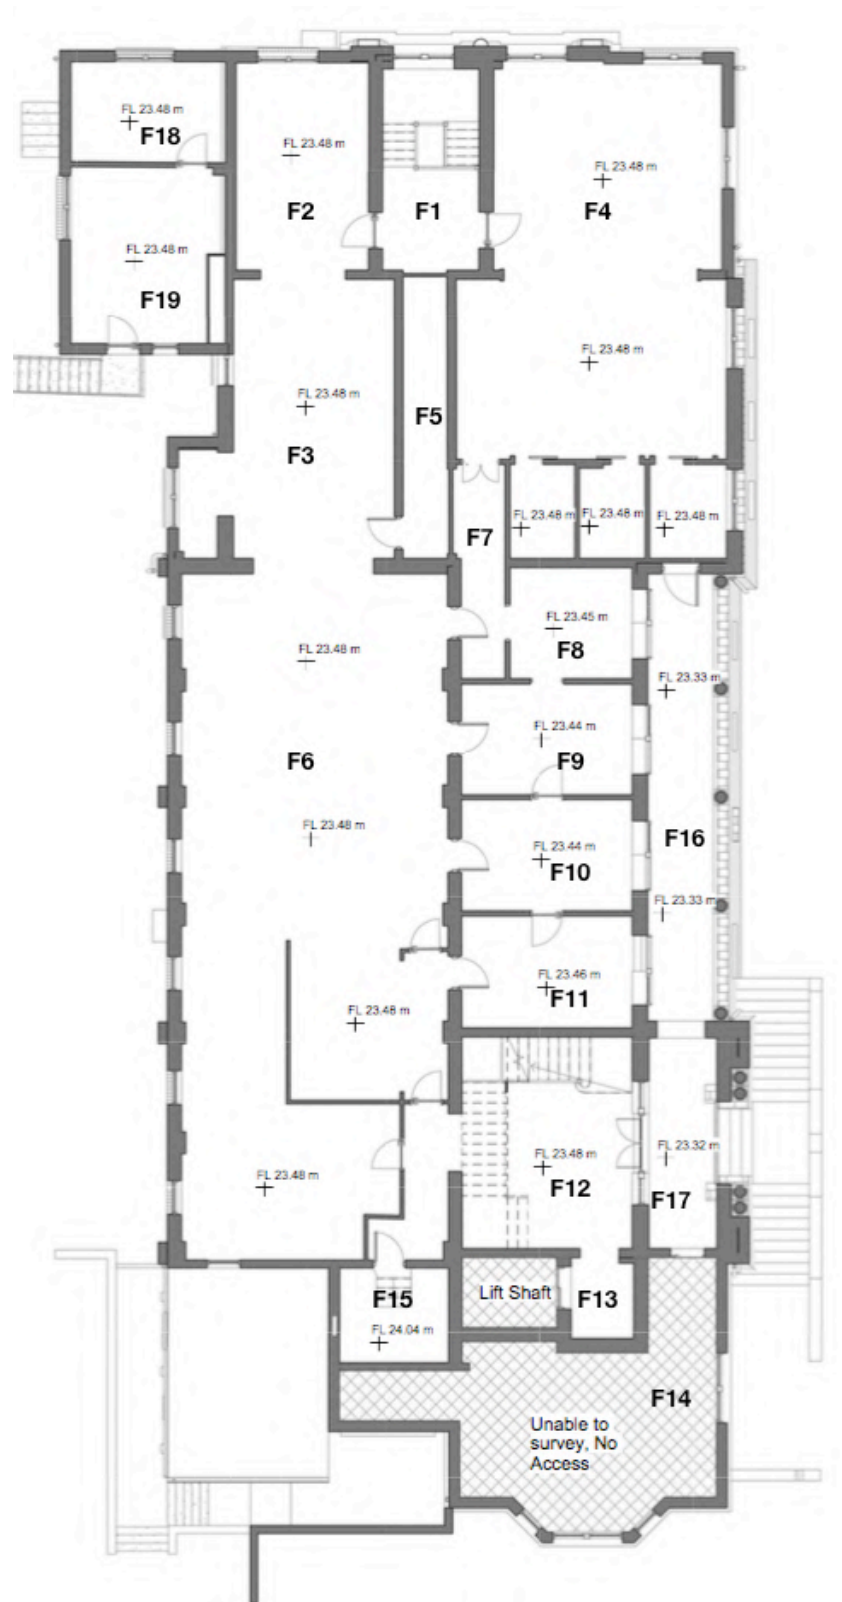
Ann Walsh Building – Ground Floor Plan
